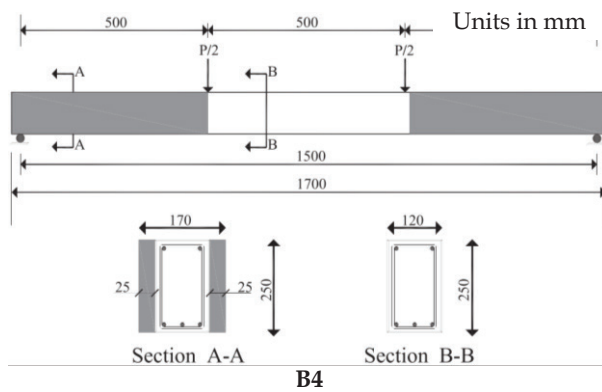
Two-Sided Jacketing only for the Shear Span of the RC Beam
